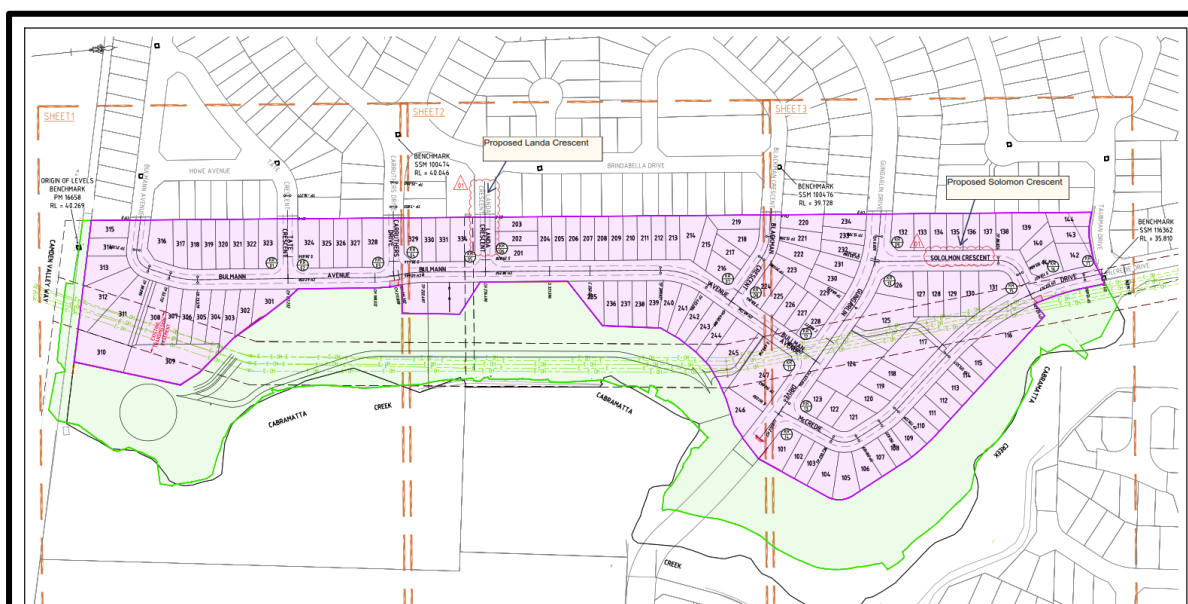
Proposed locations of Landa and Solomon Crescents within the new subdivision at 1895 Camden Valley Way, Horningsea Park
